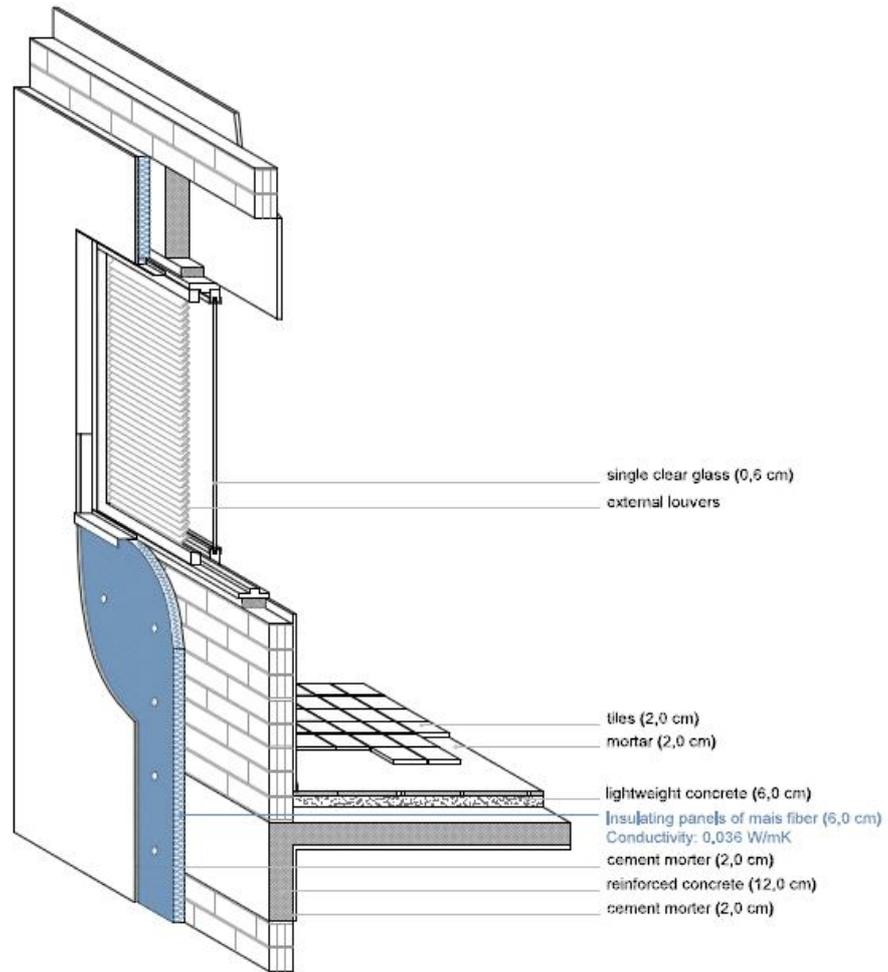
Detail 02 - wall, window and floor connection after intervention from outside
